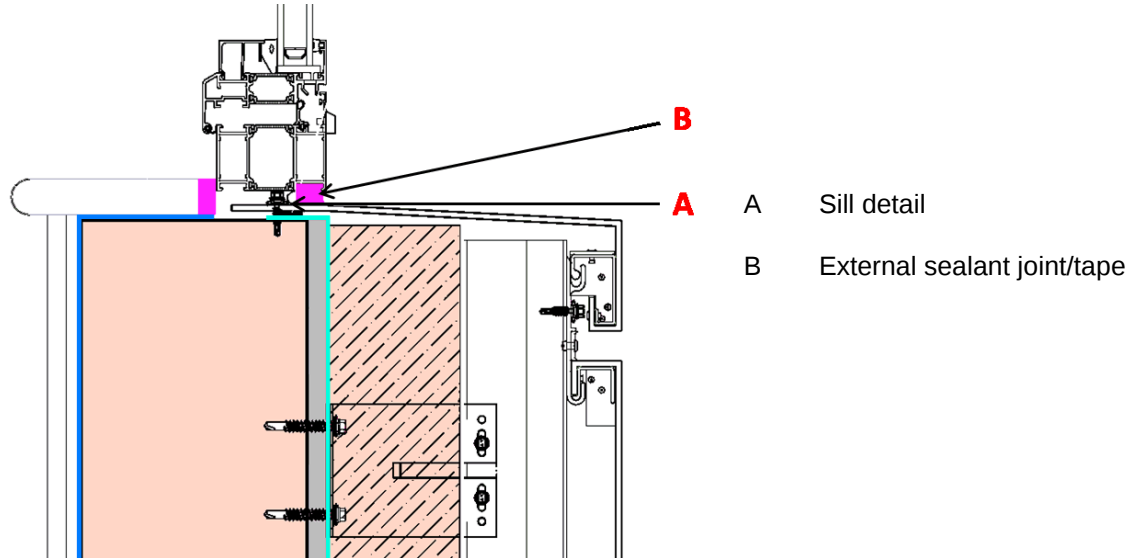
Window sill interface with rainscreen (alternative), framed back wall (insulated)
